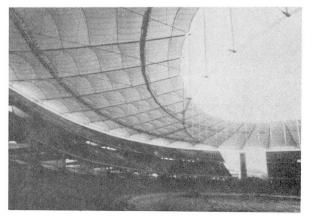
Lightweight Roof structures for the Outdoor Stadium Kuala Lumpur, Malaysia. This cable membrane roof covers 100,000 seats and with 38,500 m² roof area has become the largest stadium of the world.
